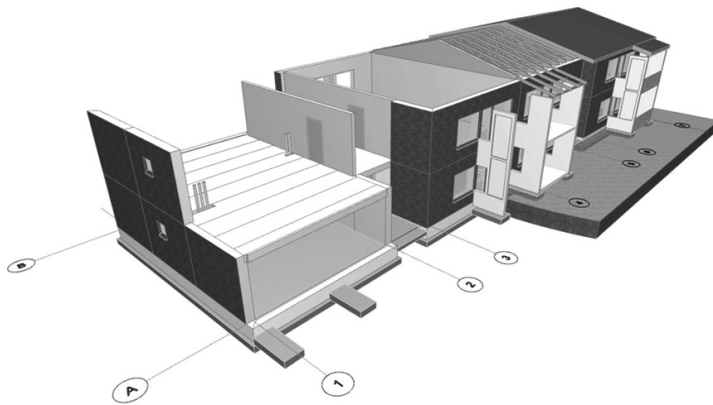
The structural core of the case building in Finland represents the BES system with a load bearing concrete frame and precast concrete sandwich façade elements. Image Simon le Roux.
